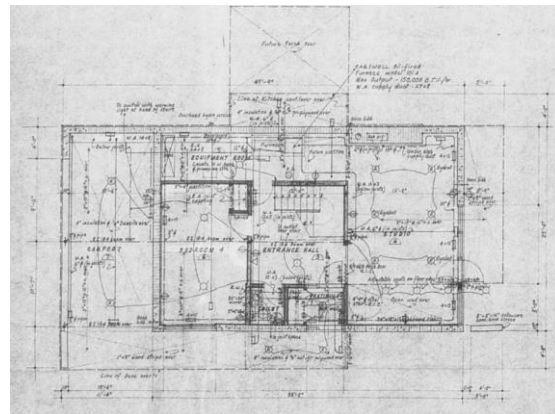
First-storey Floor Plans (BP48557 City of Ottawa 1961)
